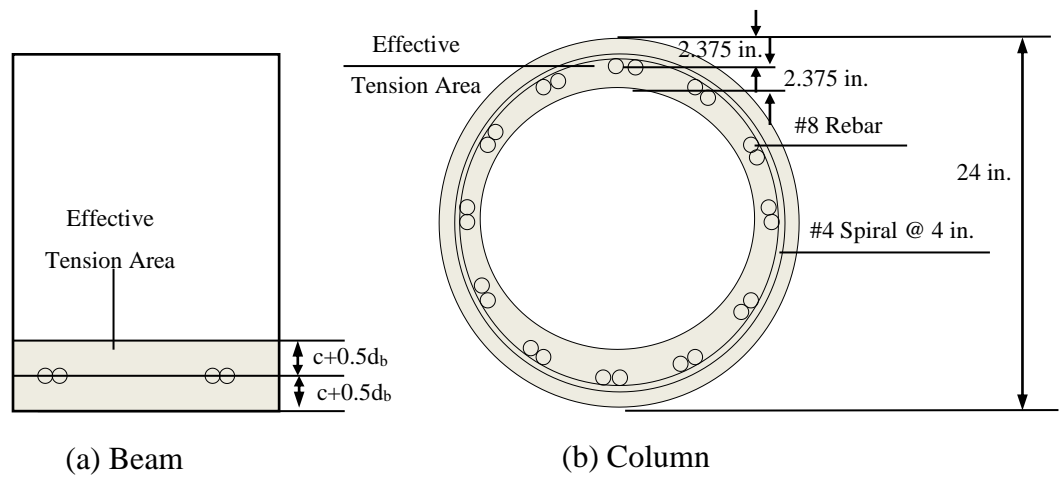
Detail of Effective Areas for Composite Section (1in. = 25.4 mm.)
